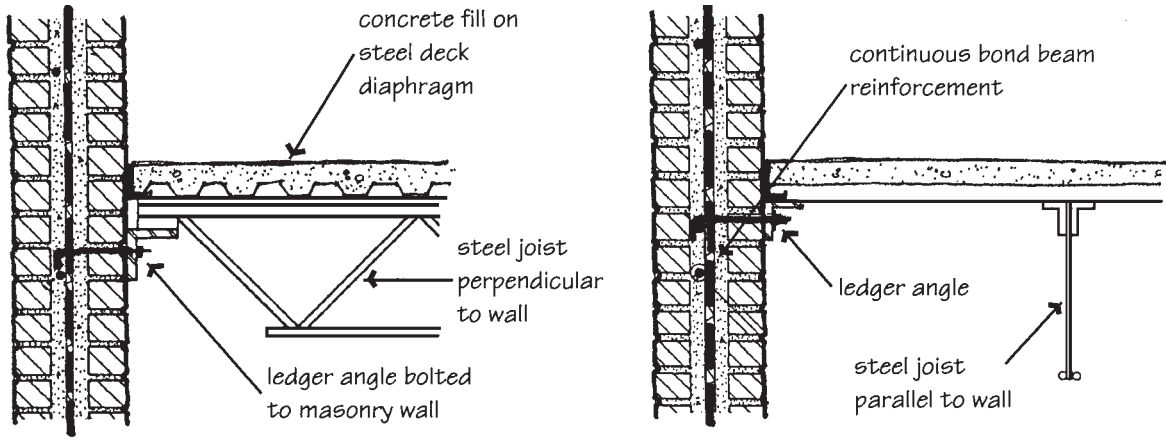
Examples of single-wythe masonry wall connections to steel beams and open web steel joists.
